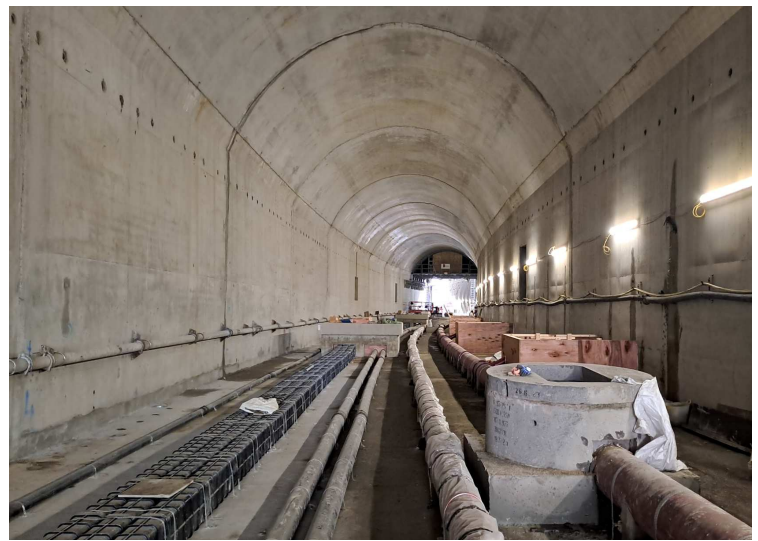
Highway Construction within the 'Cut and Cover' Tunnel Silvertown
